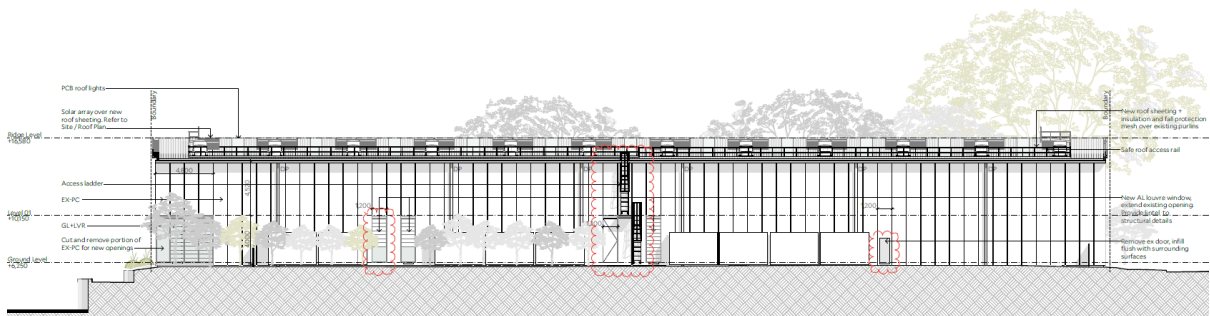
Proposed south elevation, largely concealed by the adjoining 4A Huntley Street
